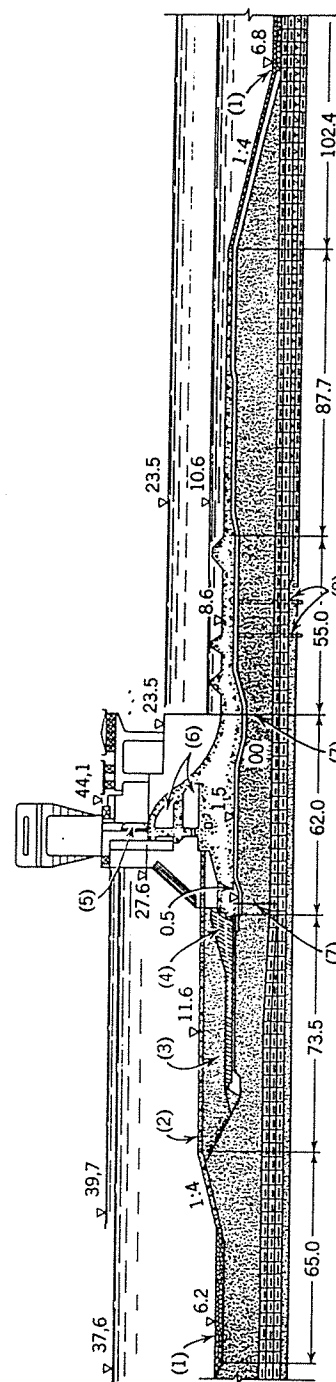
Spillway dam for Volga Hydroelectric Station, USSR. (After Borovoi, Razin, and Eristov.) (1) rockfill, (2) concrete plates, (3) sand, (4) compacted clay, (5) main gate, (6) hollows, (7) steel sheeting, (8) relief wells. Dimensions are given in meters. (See "Some Large Dams of Hydro-projects in the U.S.S.R.," contribution to "Topmost Dams of the World," The Japan Dam Assn., Tokyo, Japan, Oct. 1963, pp. 224-5.)
